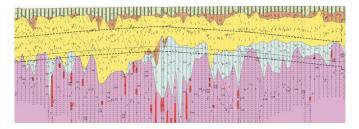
Shallow buried route planning in karst development area of Guangzhou Metro Line 9
